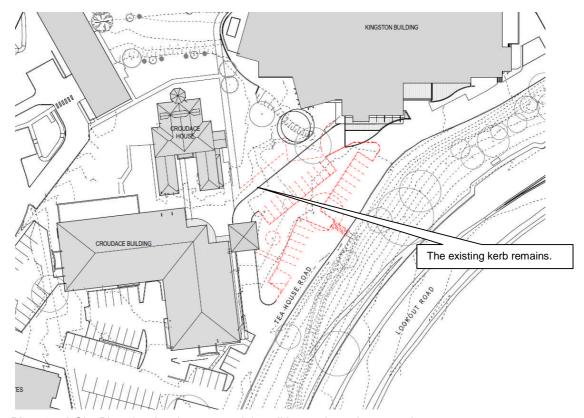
A Site Plan showing the proposed demolition works to the car park area. (DWP|Suters sheet SK 021)
